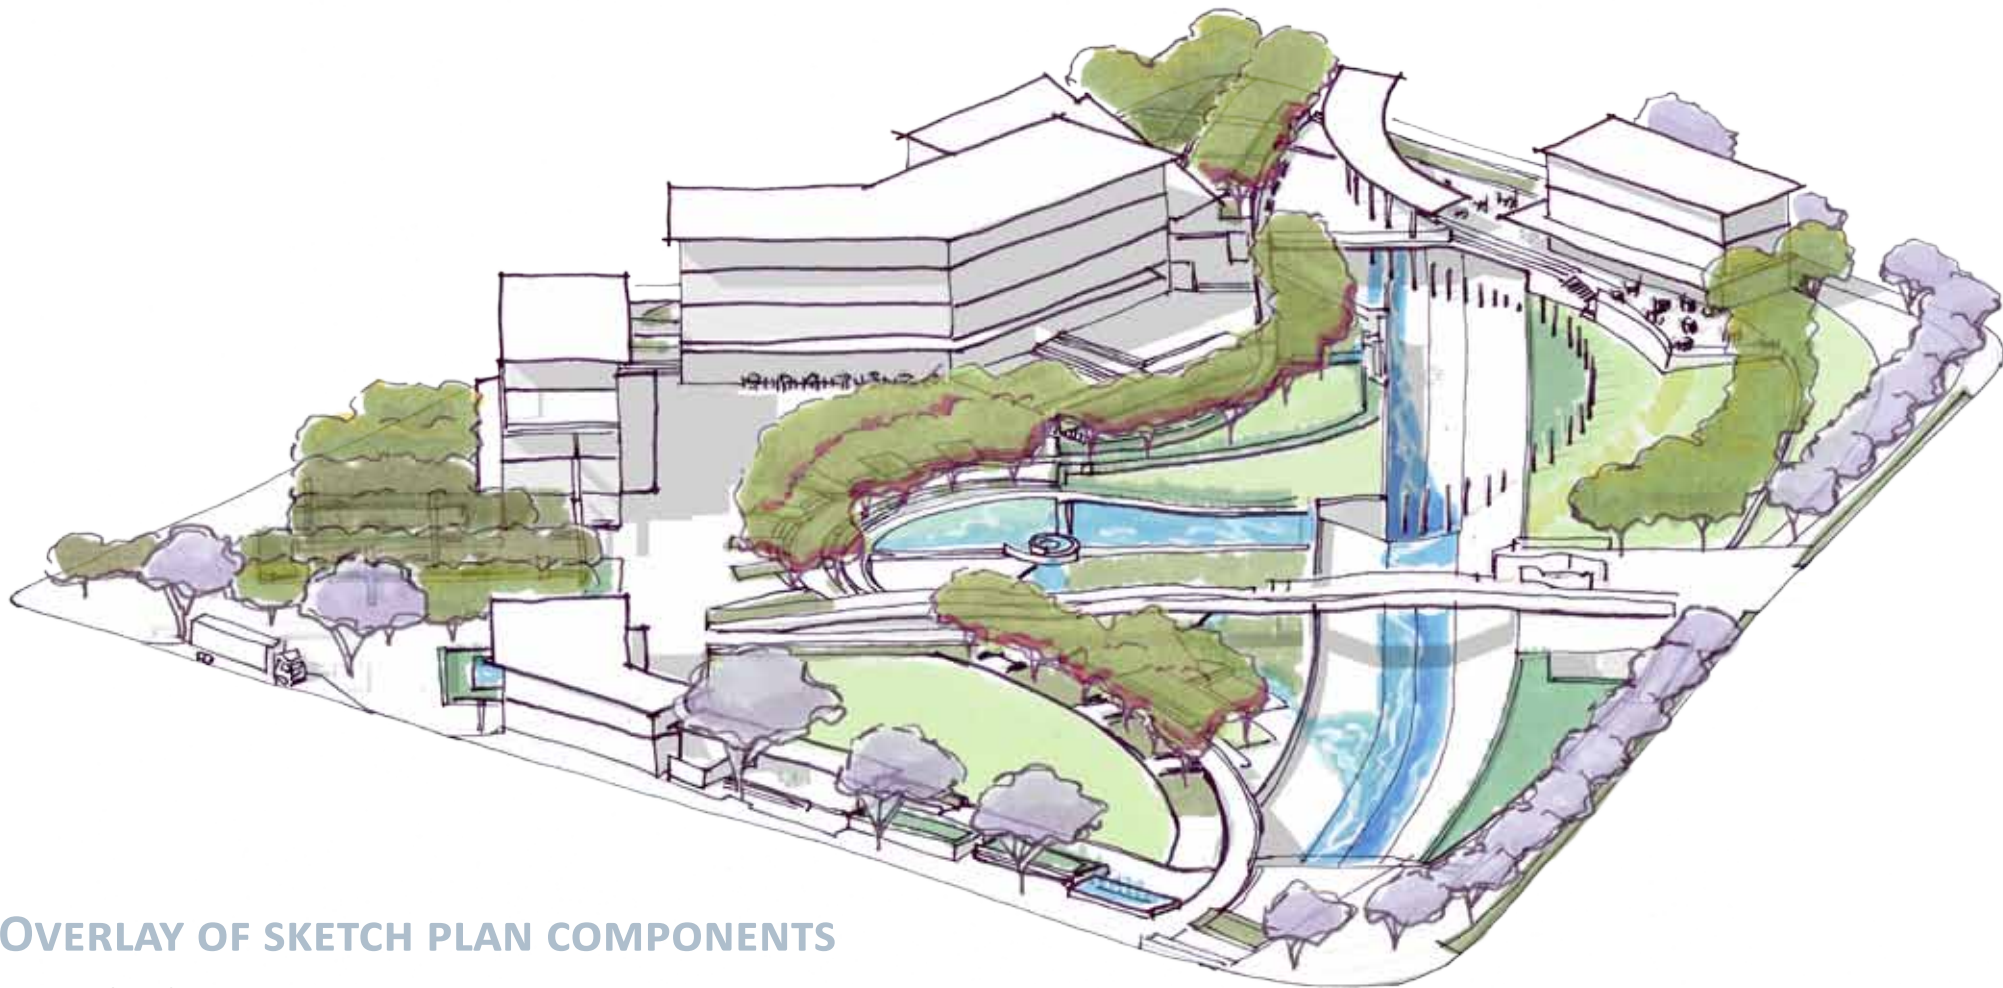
SKETCH PLAN - SCALE 1:1000
